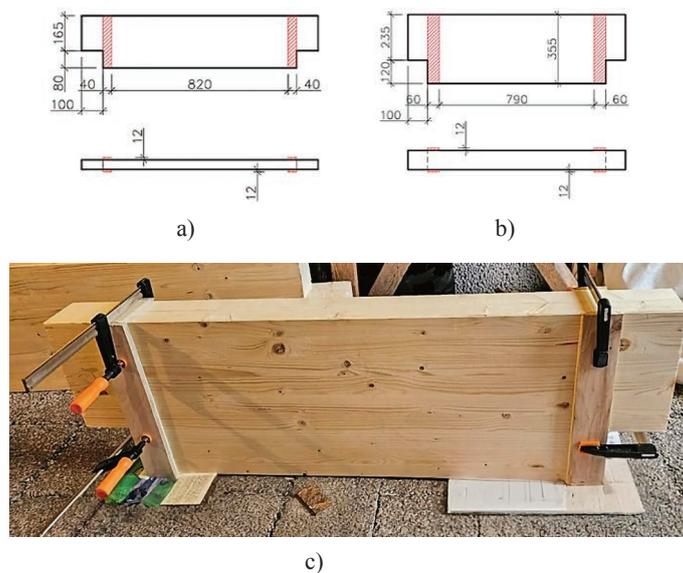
Schemes (a, b) and an overview (c) of solid and glulam timber beams reinforced with plywood strips
